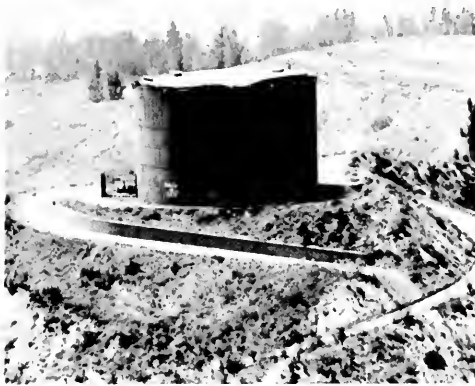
Granada High Tank. Over-all view of tank. Note damaged roof. Los Angeles Department of Water and Power photo.
